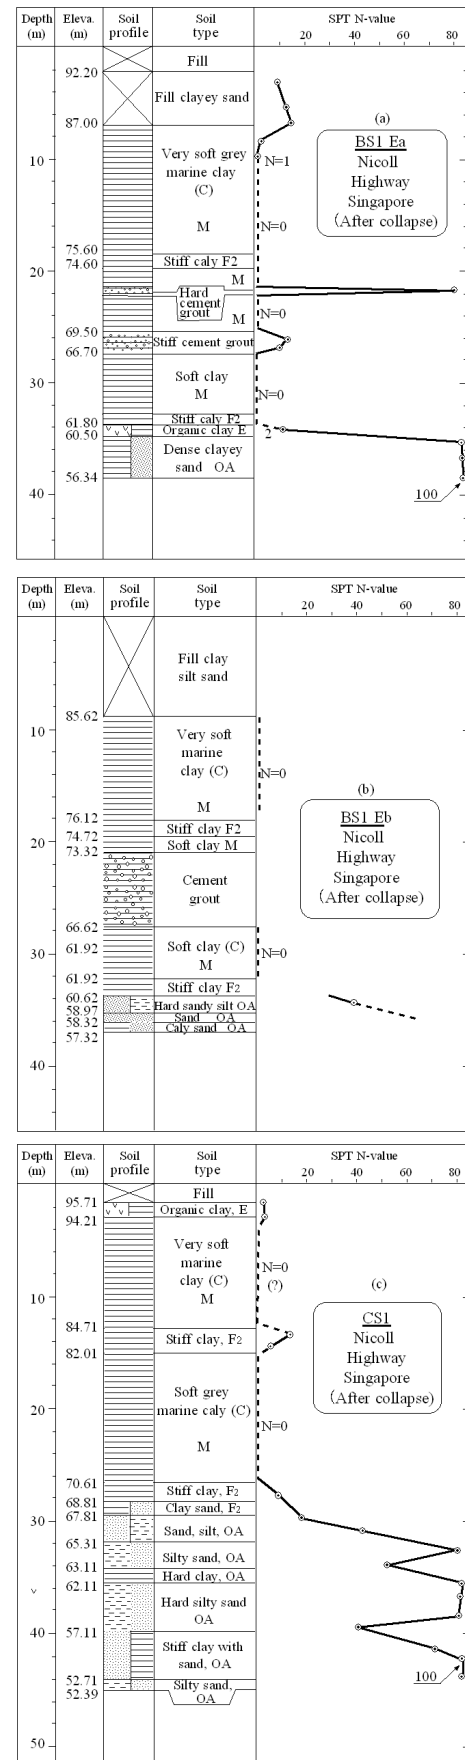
Soil profiles just south of the collapsed diaphragm wall panels.
